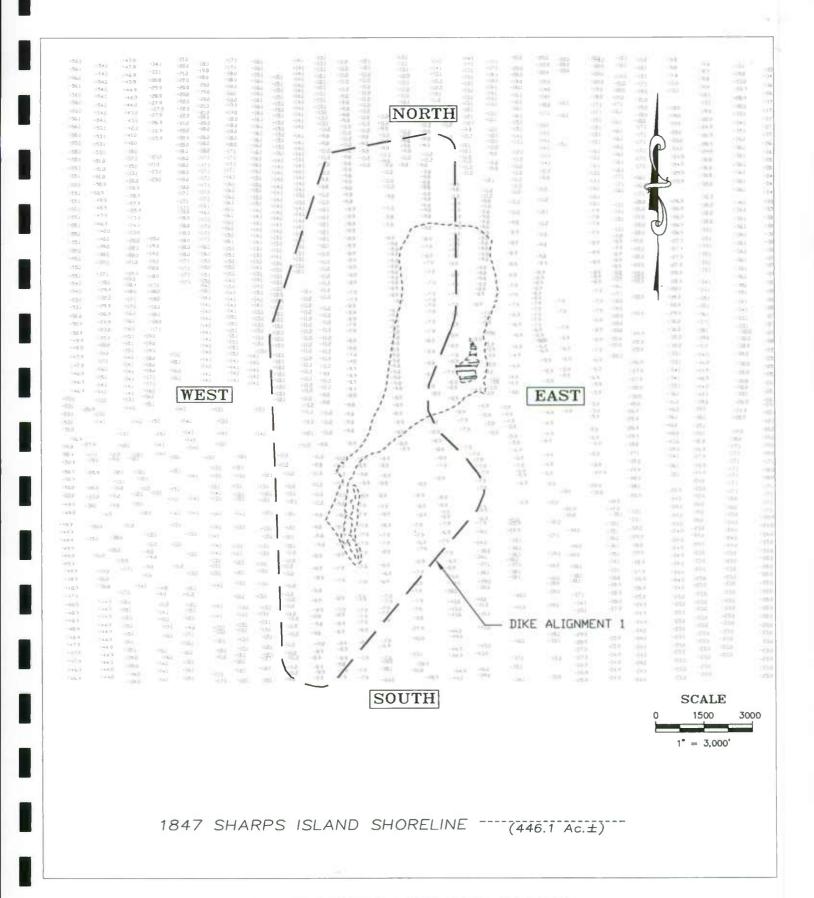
South, West, North and East dike sections used to determine dike elevations and armor stone sizes.
